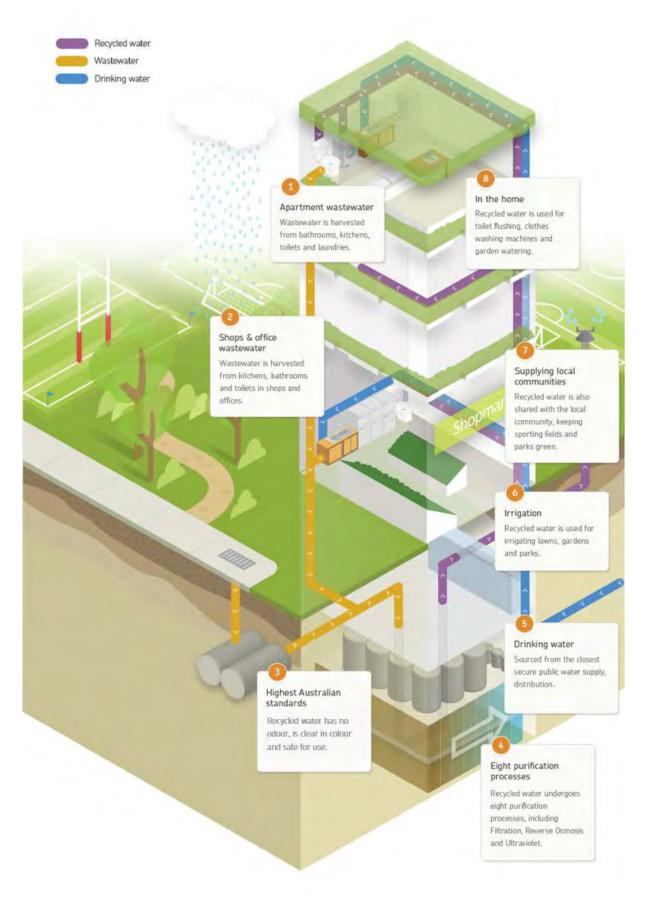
Indicative sewage and recycled water systems within vertical buildings
